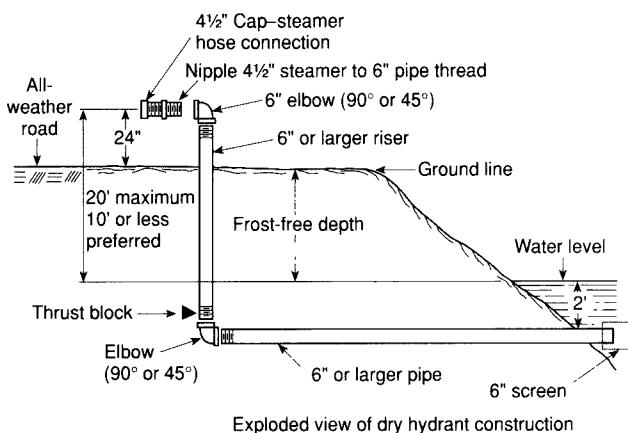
(a) Dry fire hydrant construction using iron, steel, or PVC pipe.
